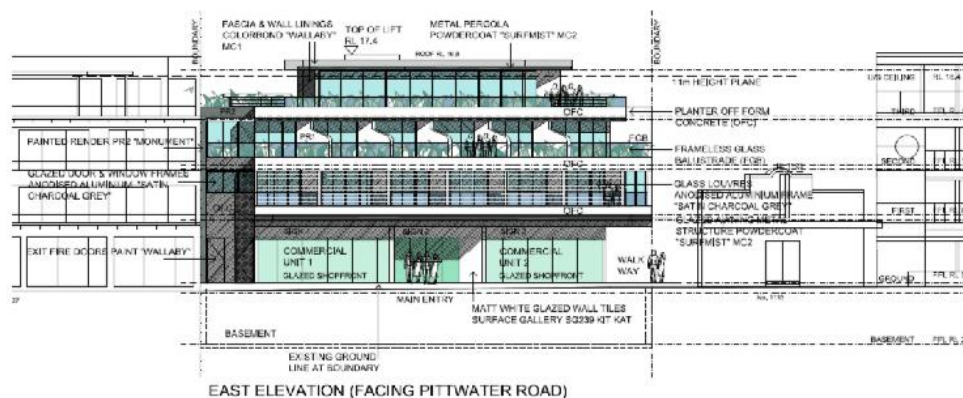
Plan (east elevation) extract showing extent of 11 metre building height breach
